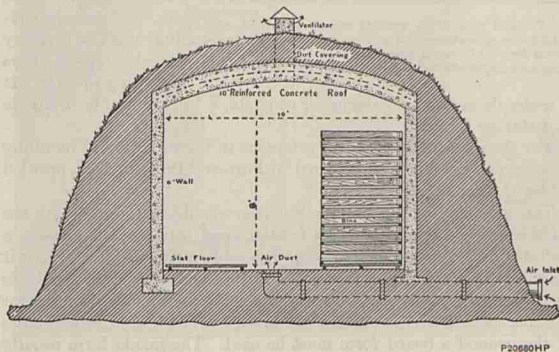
Cross section of a concrete storage cellar, showing the arrangement of ventilators, slat floors, and bins, with provision for the circulation of air under and around the slat floors and bins. This cellar is 10 feet wide and 8 feet high, inside measurement.
